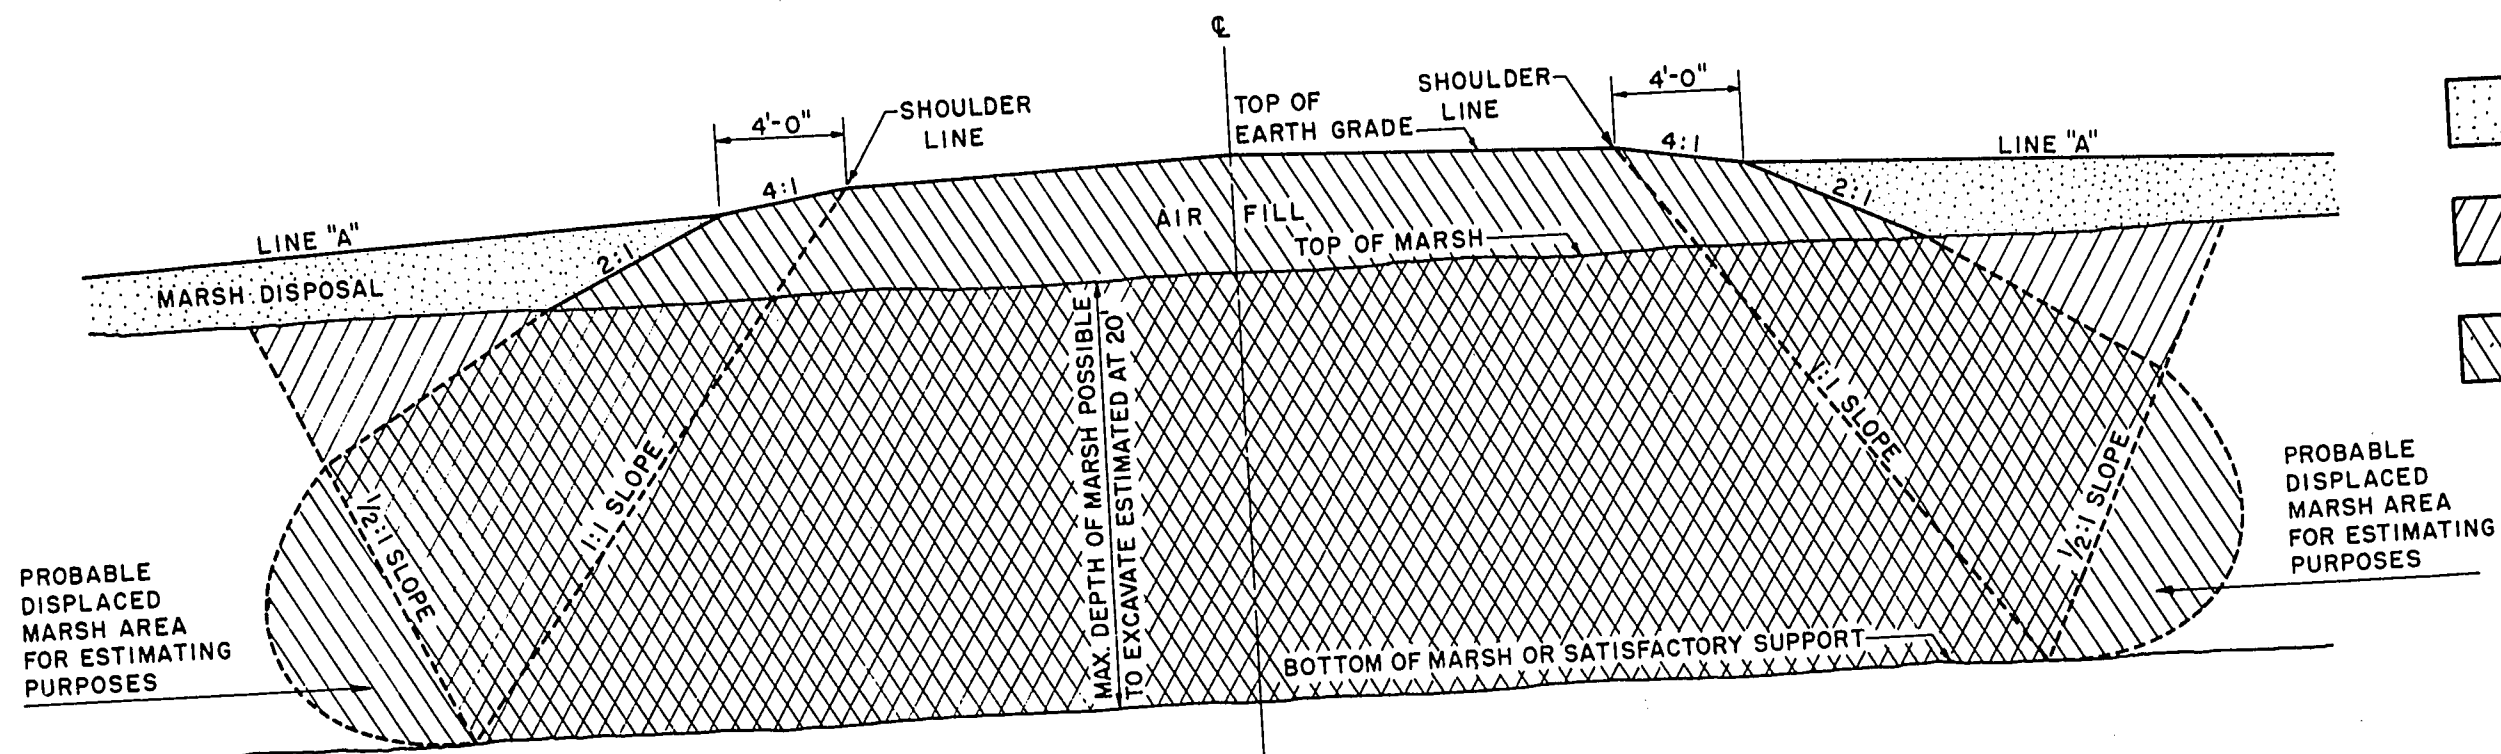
PLAN PROFILE OF ROAD STANDARD
